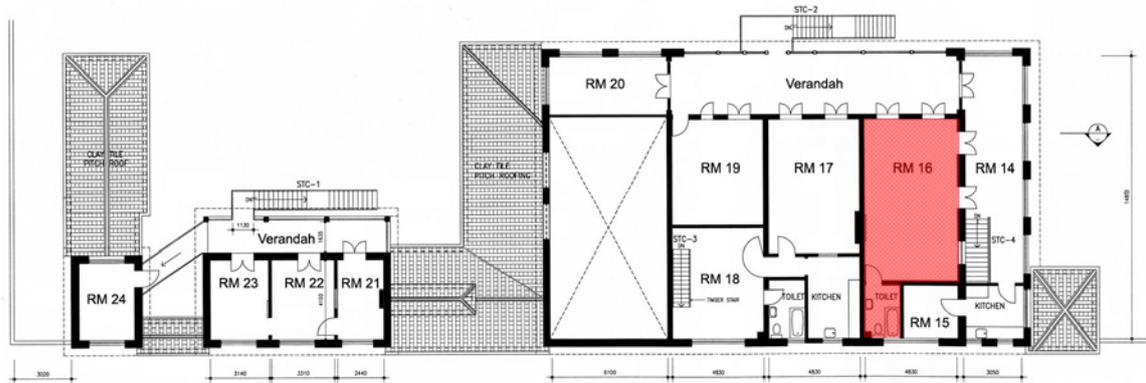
Location of RM 16 on the first floor at the former clubhouse (1:400).
